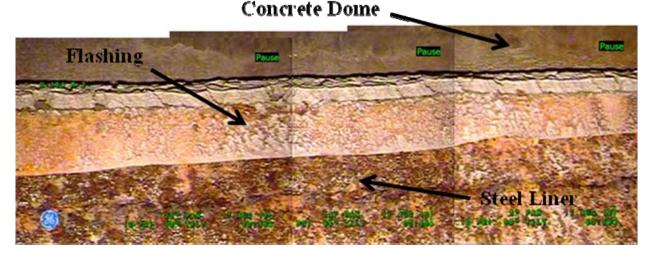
FY 2010 Inspection of Tank 241-U-104 Steel Liner and Reinforced Concrete Haunch
